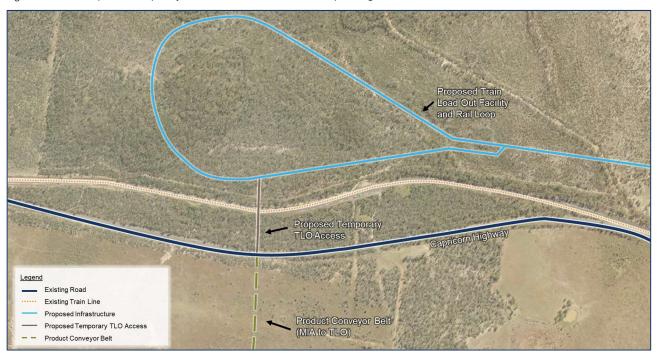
Proposed Temporary TLO Access Intersection Concept Design
